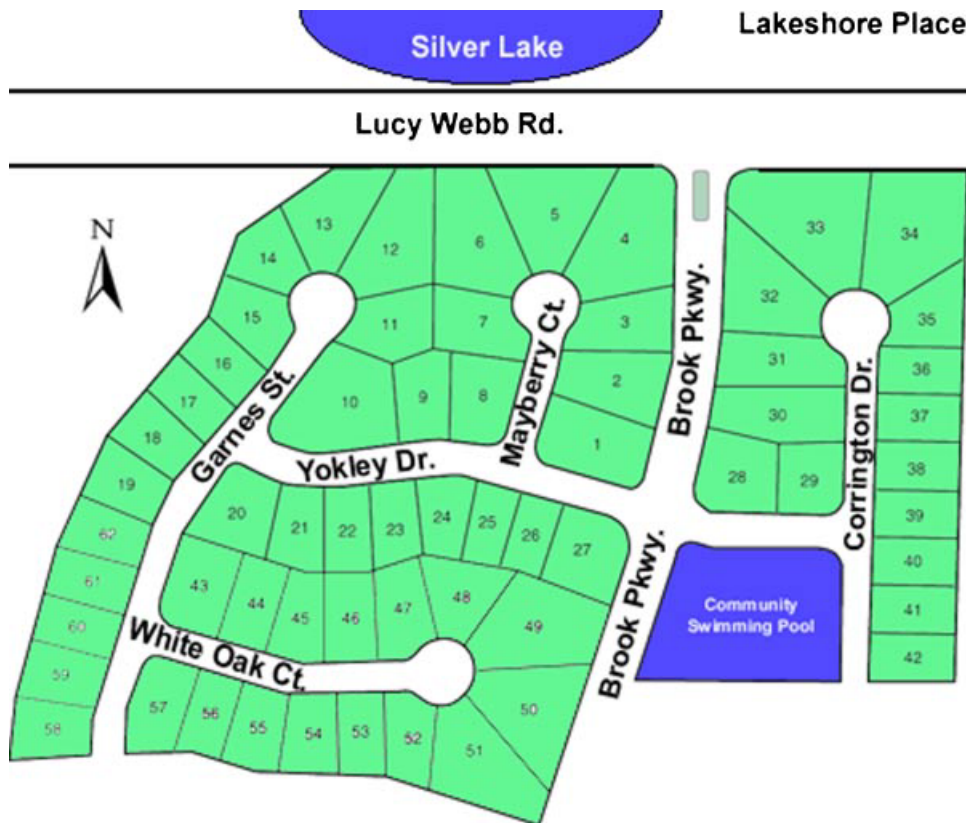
Site plan. [Color figure can be viewed in the online issue, which is available at www.interscience.wiley.com.]
